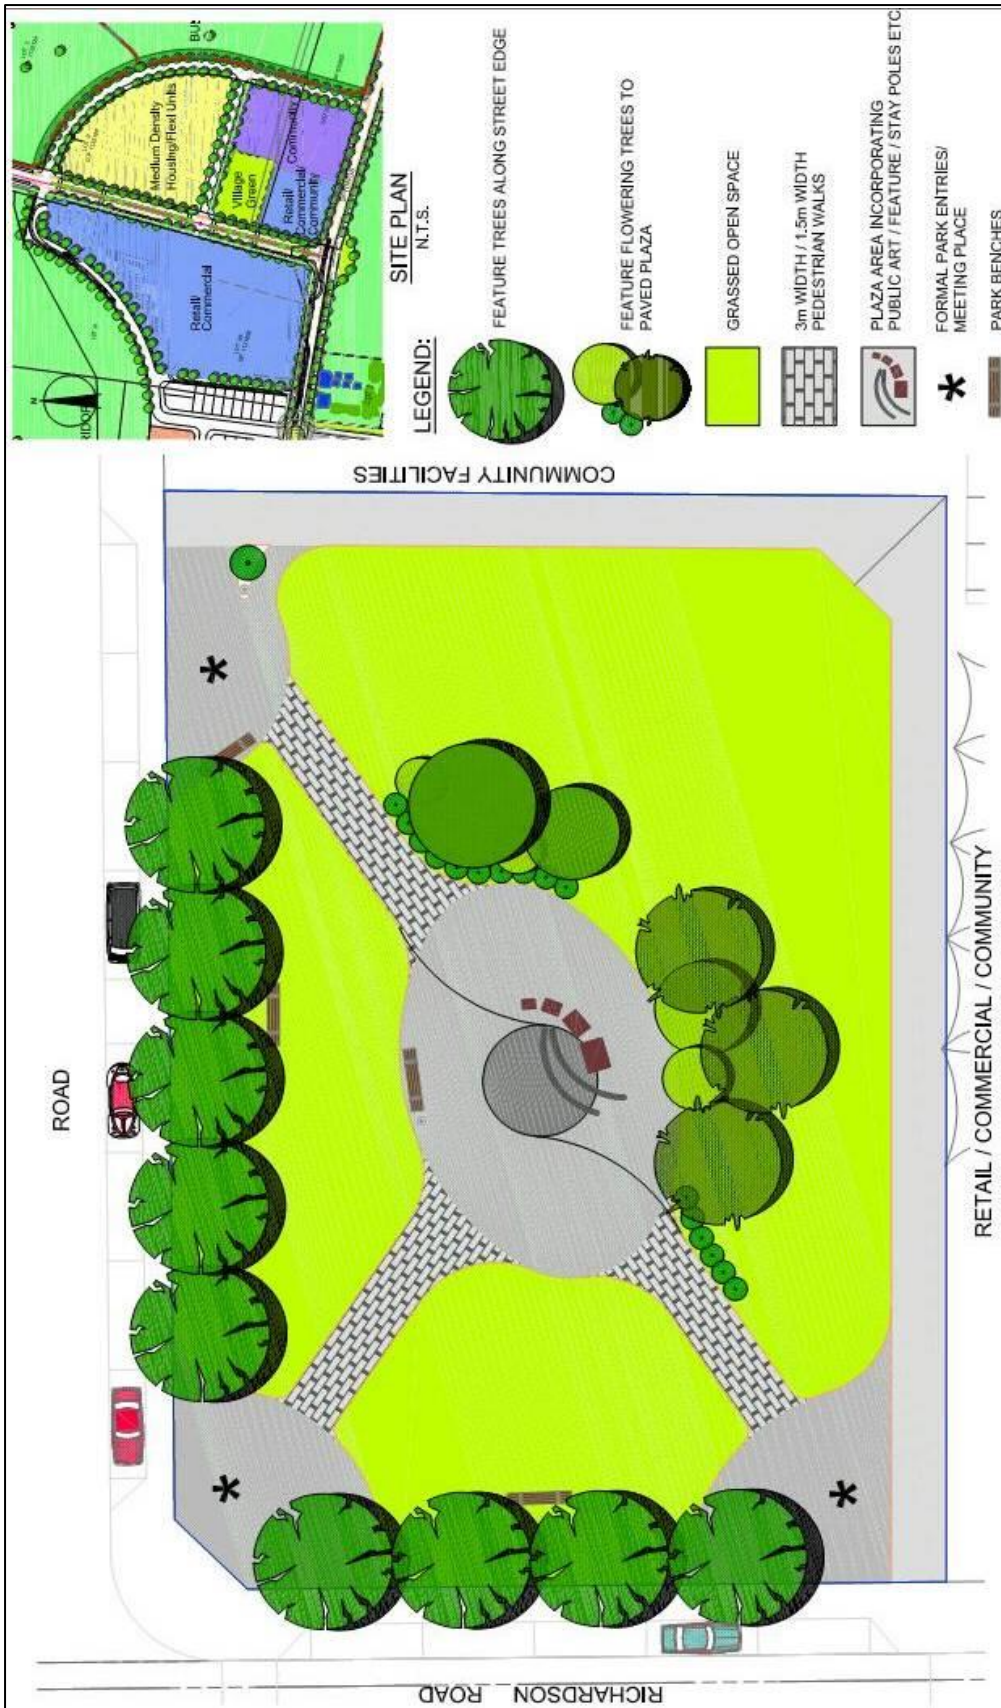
Spring Farm Neighbourhood Centre Village Green Concept Plan
